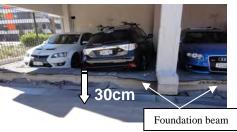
Substantial settlement of surface soils due to liquefaction; deep pile foundations prevented significant settlement of the building
